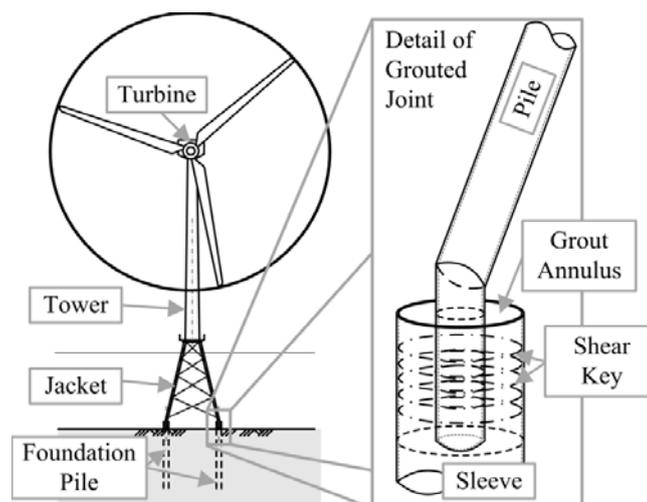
Grouted joints in a jacket substructure for OWTs and detail of grouted joint
